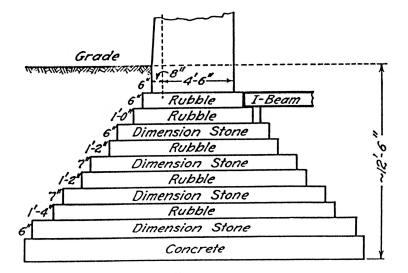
SECTION THROUGH EXTERIOR PIER OF HOME INSURANCE BUILDING
